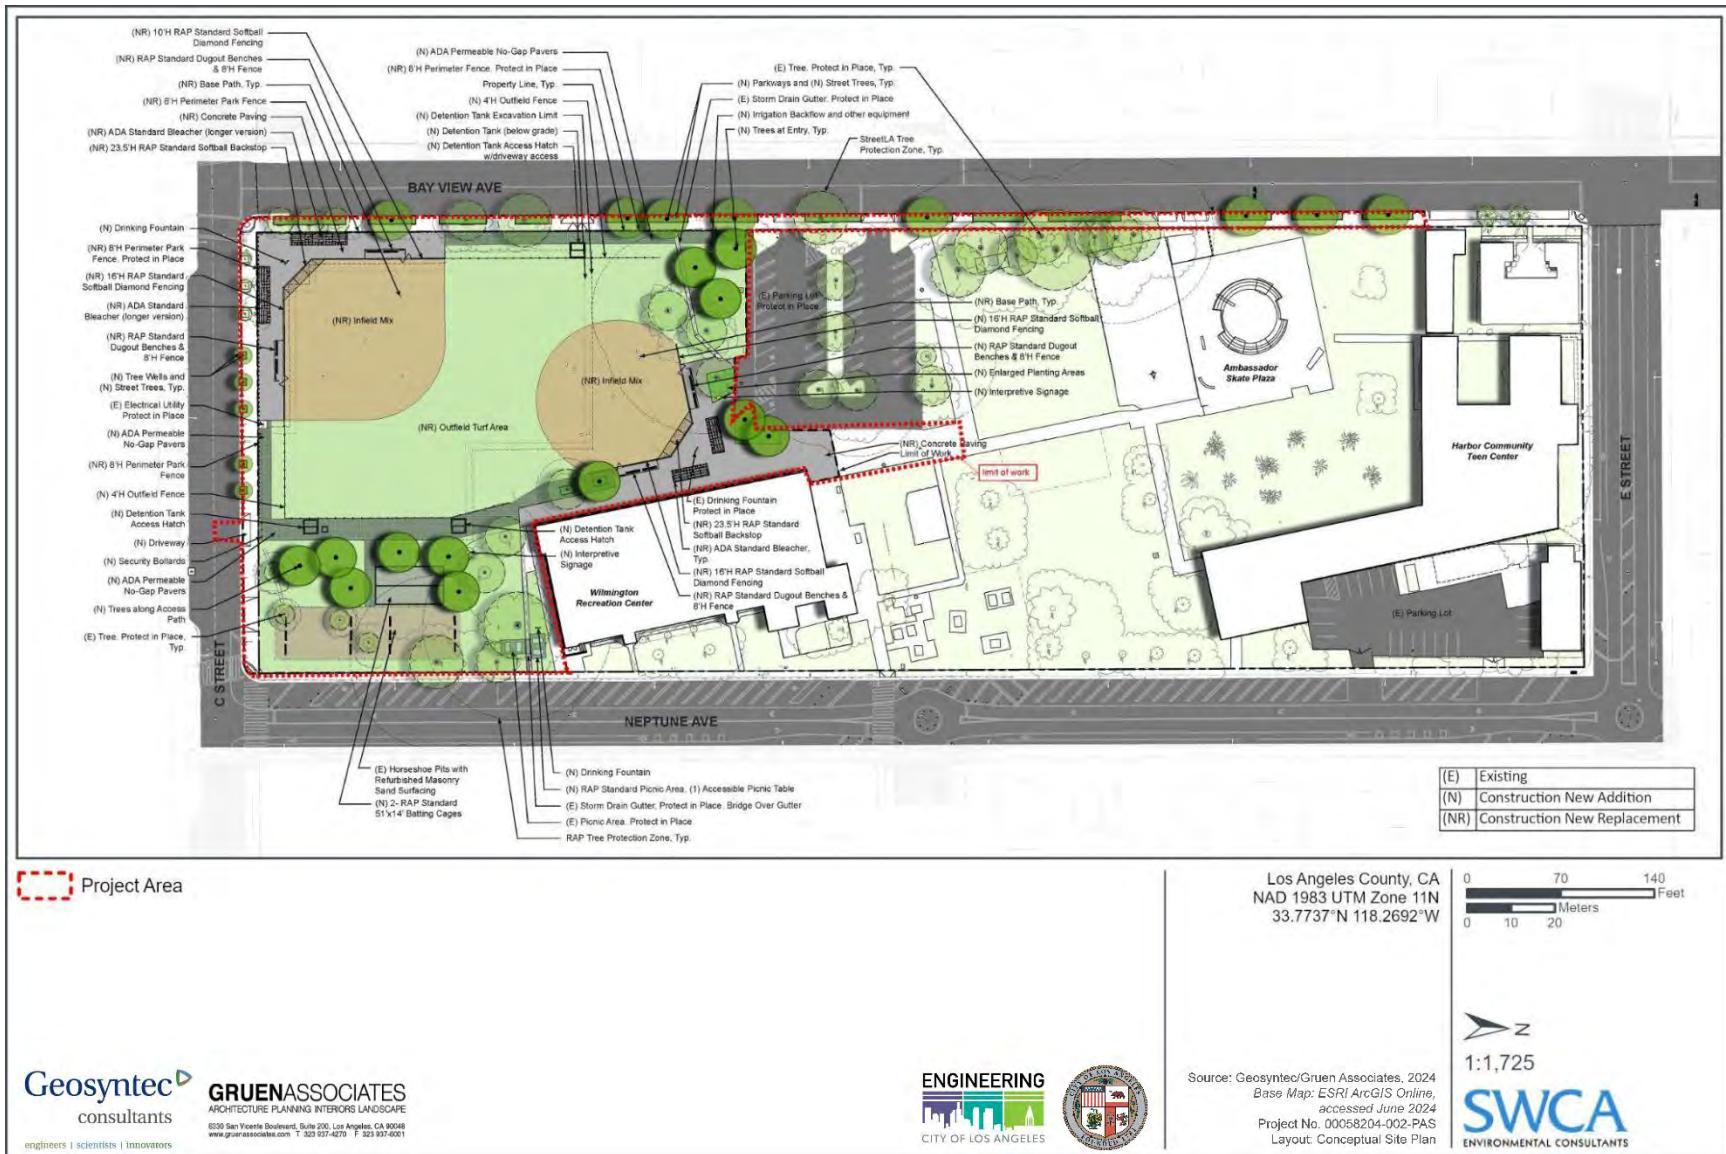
Site plan for the Wilmington Neighborhood Greening Project.
